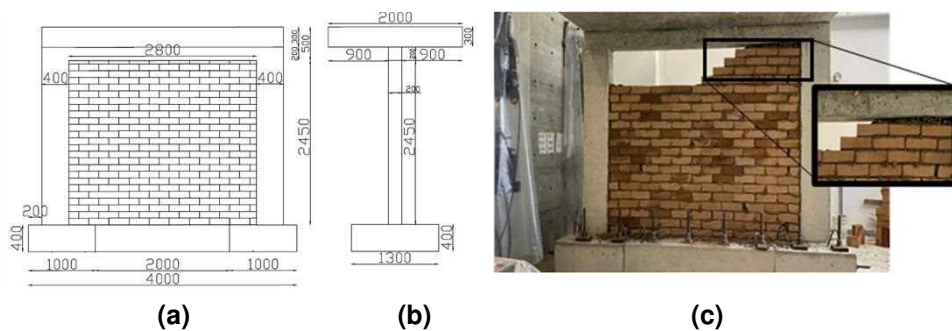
(a) Geometry of the masonry-infilled RC frame front view; and (b) side view, and (c) Construction of masonry-infilled RC frame.
